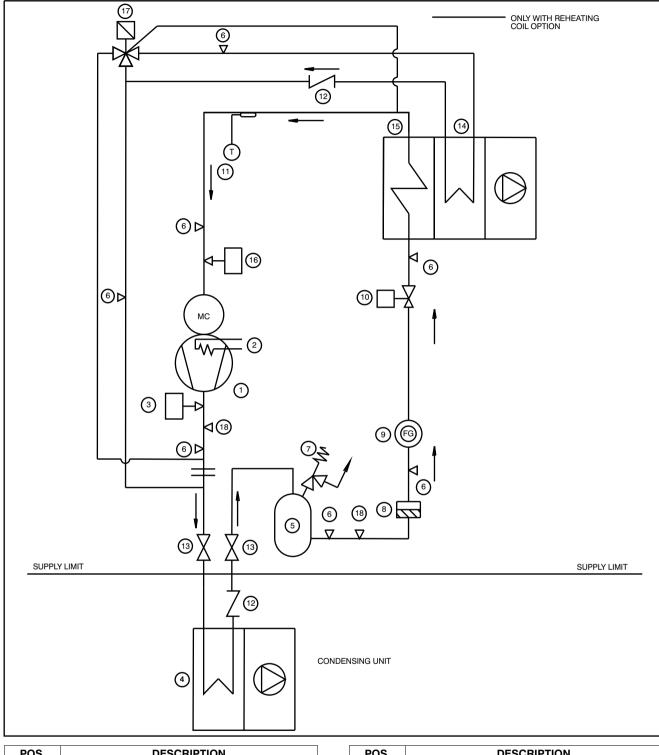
Refrigerant circuit A version - Single circuit - Single SCROLL compressor - EEV
